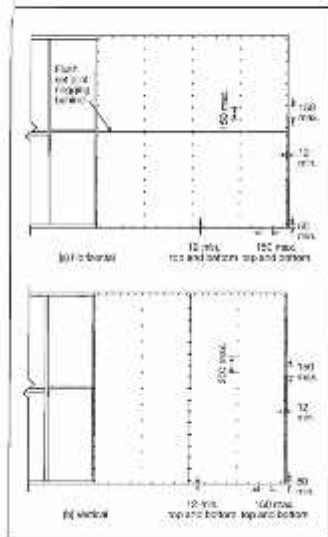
WALLING DETAIL FOR VILLABOARD SHEETS ON VERGE (HORIZONTAL)
